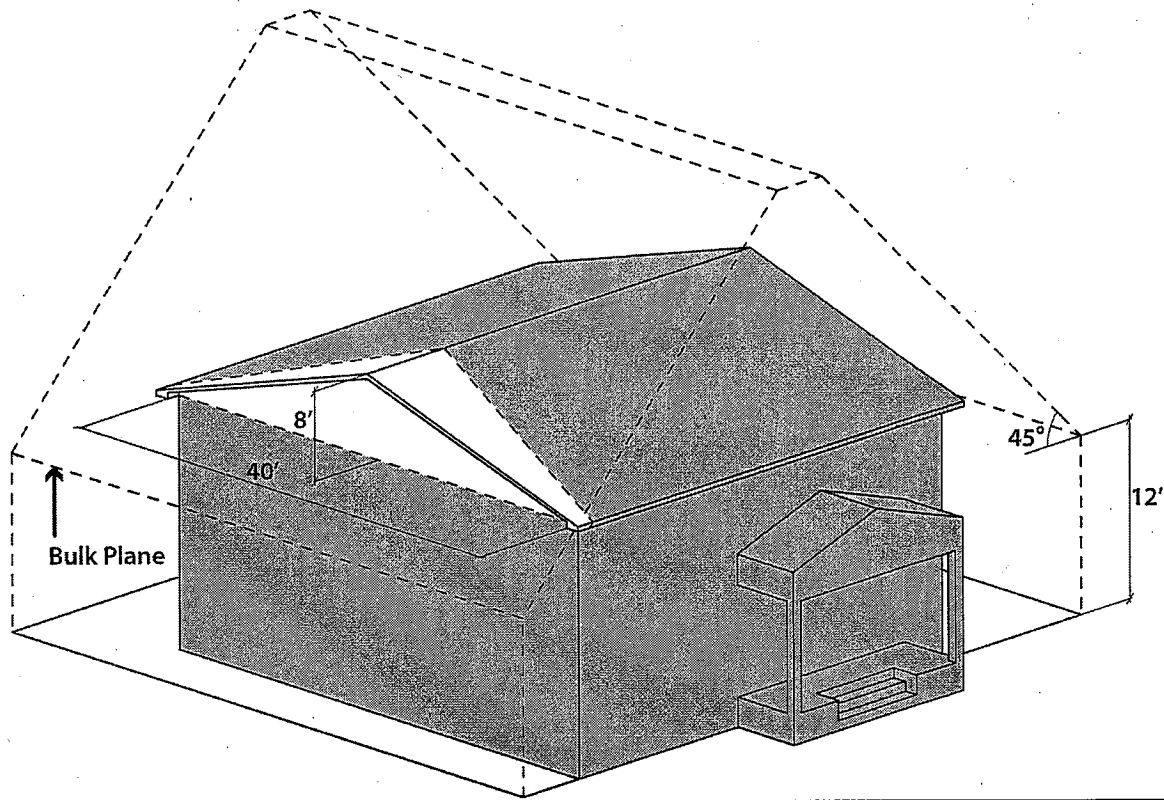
Gable Roof End Encroachment into the Side Yard Bulk Plane
